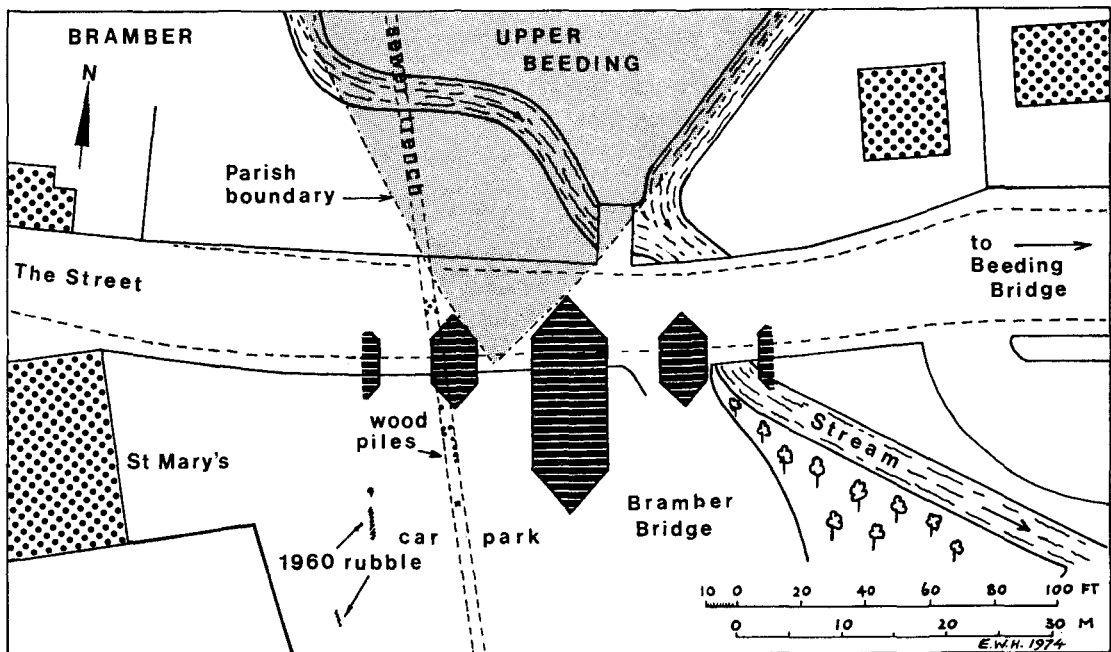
Bramber Bridge. Plan of the bridge piers (after Figg, 1849) and the sewer trench
